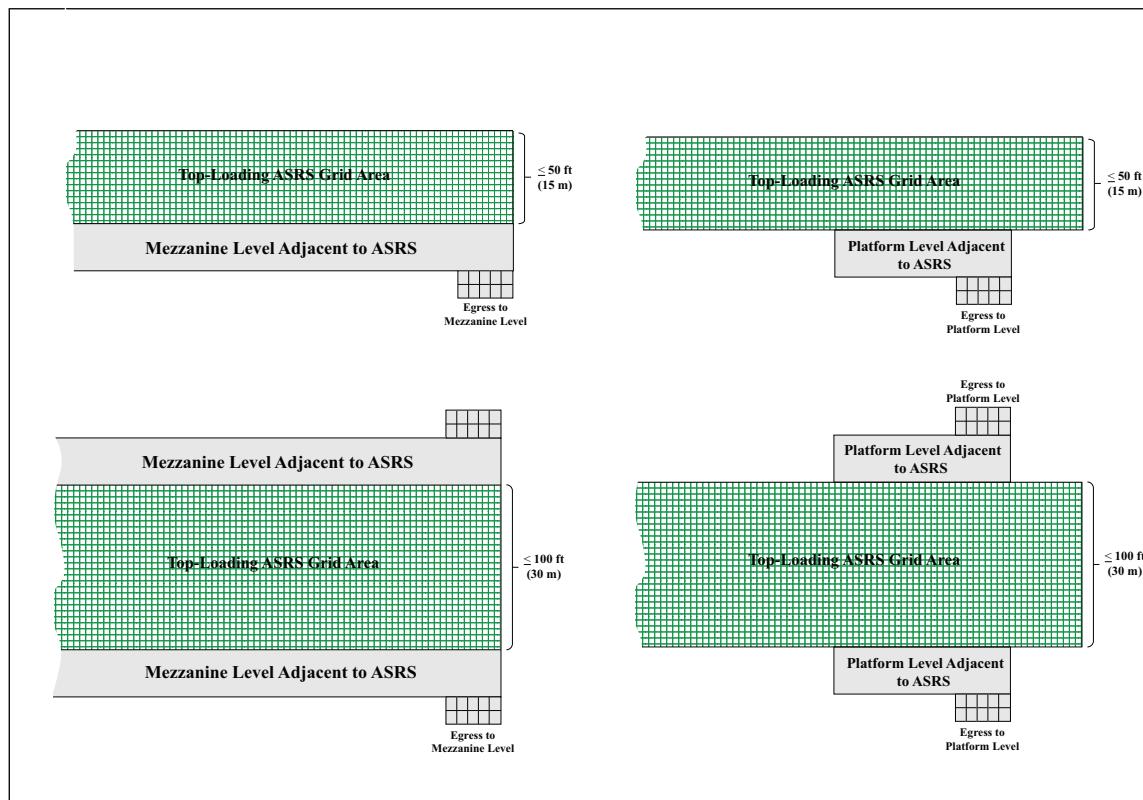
Examples of a TL-ASRS arrangement showing maximum 100 ft (30 m) depth in one direction
